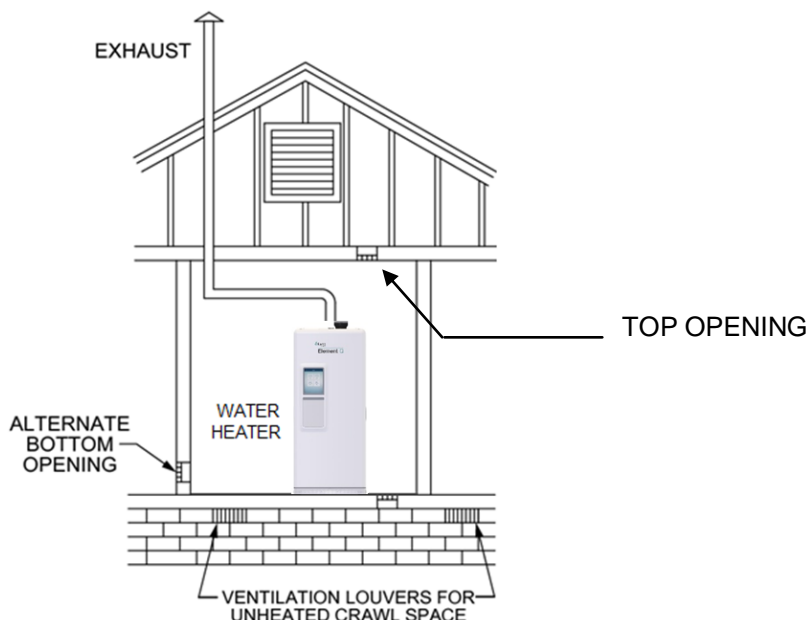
All Combustion Air from Outdoors - Inlet Air from Ventilated Crawl Space and Outlet Air to Ventilated Attic
